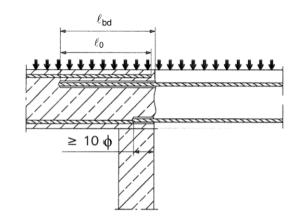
End anchoring of slabs or beams (e.g. designed as simply supported)
